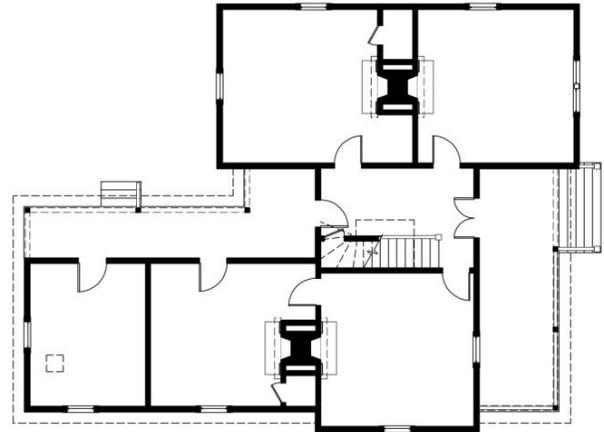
Long House. First Floor Plan, reconstructed showing probable original configuration of porch. See drawing A-3 in Part III.
